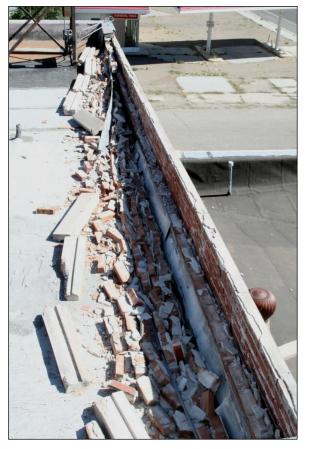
Parapet failure onto the roof of the El Rancho Hotel. The parapet appears to lack cross-tie bricks and the inner wythe of bricks has delaminated and fallen onto the building, along with the crowning concrete bond beam that capped the top of the parapet/wall.
